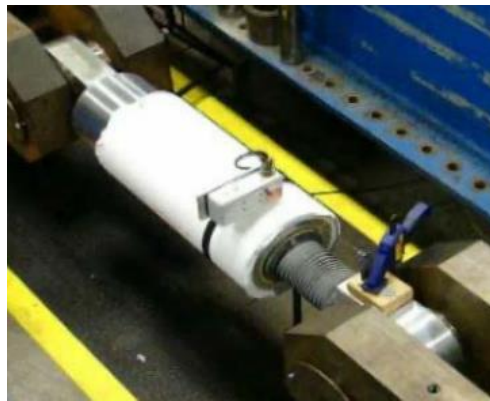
A Tested Story-installation-type FVD (Taylor 2011)
